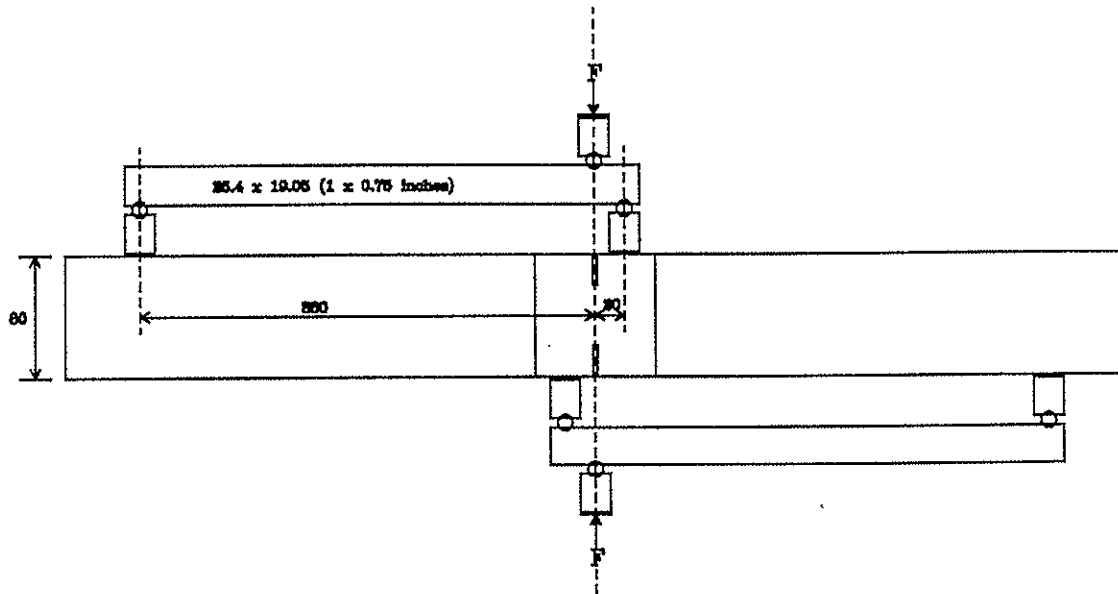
Test arrangement to cause shear failure in mode I beam specimen .
